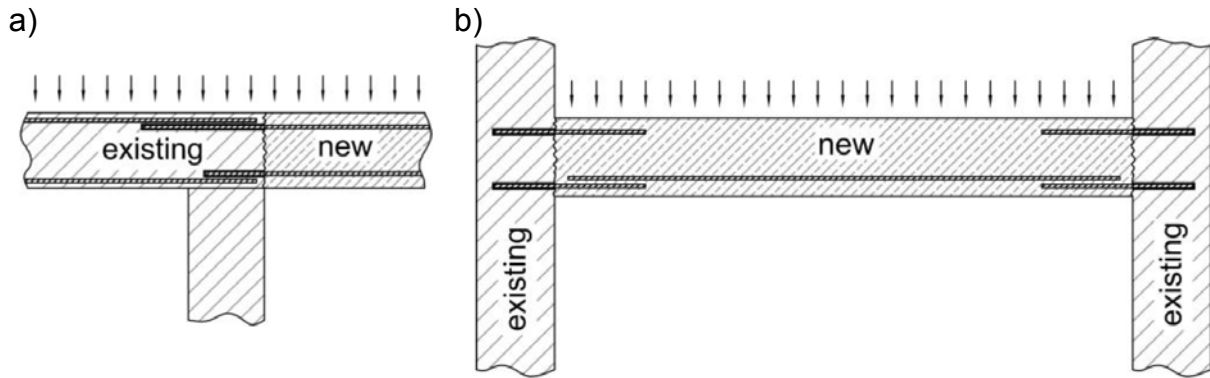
Connections with post-installed reinforcing bars for a) overlap joints ('splicing') and b) end anchoring ('anchorage') (*Fib Bulletin No. 58 (2011)*)
